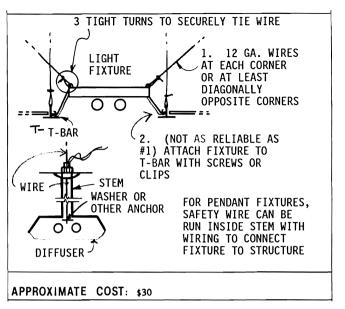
Hanging light fixtures can be made safer with additional wires or anchoring to keep them from swaying and with reinforced suspension to keep them from falling.
